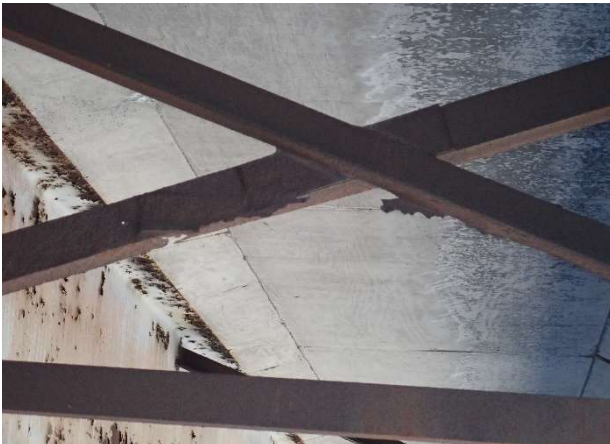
Span 8 Waterline insulation in bay 5, near pier 7
